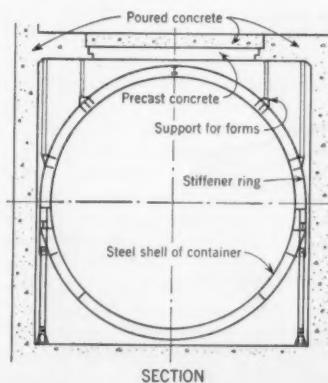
Section through a steel shell shows how tops of concrete boxes enclosing all three steel-shell containers were designed to avoid supporting formwork and wet concrete on top center of shell. (See also photo on cover.)
